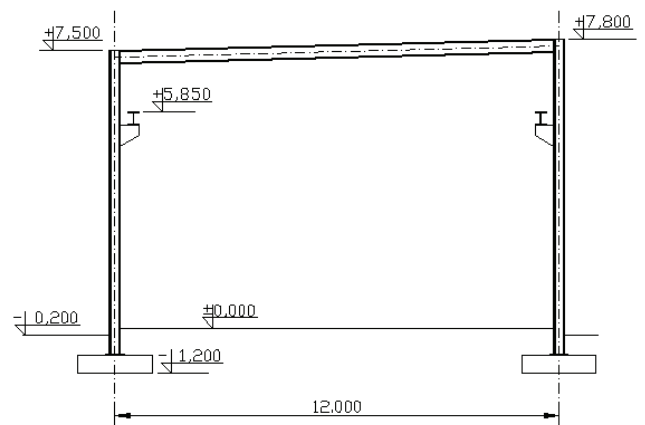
Cross-section of the industrial steel building with a handling system [6]
